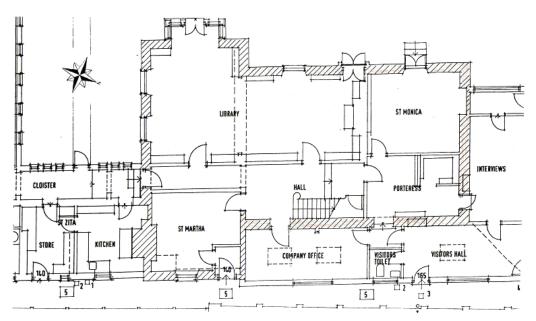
Ground floor plan (Lee and Ross, Architects Oxford, 1997 with permission)
